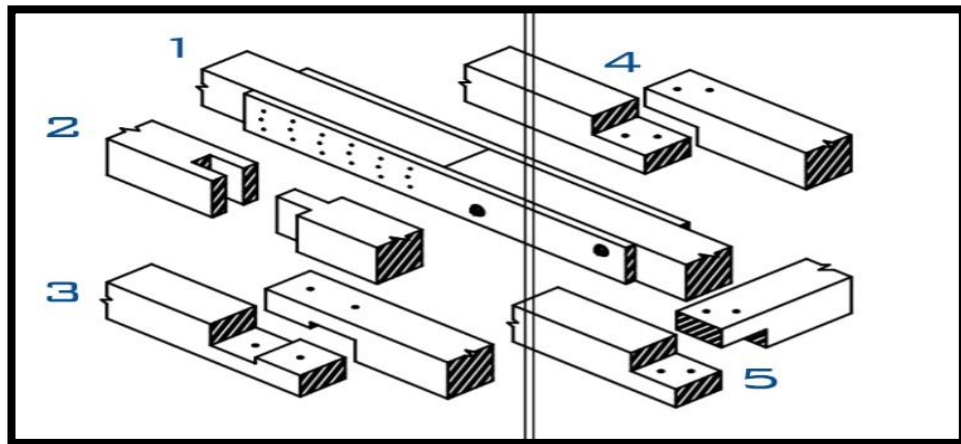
Structural joints from traditional wooden elements with the addition of steel connections
